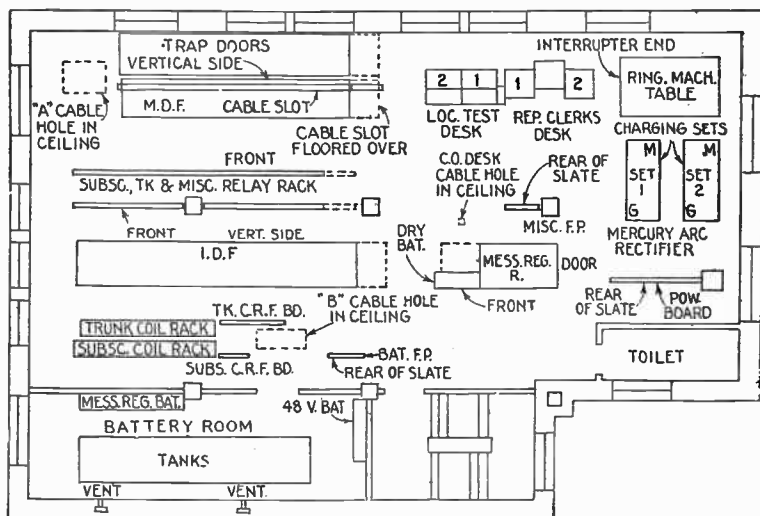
,530.—Typical layout of a Central office terminal room which also contains the power plant equipment.
